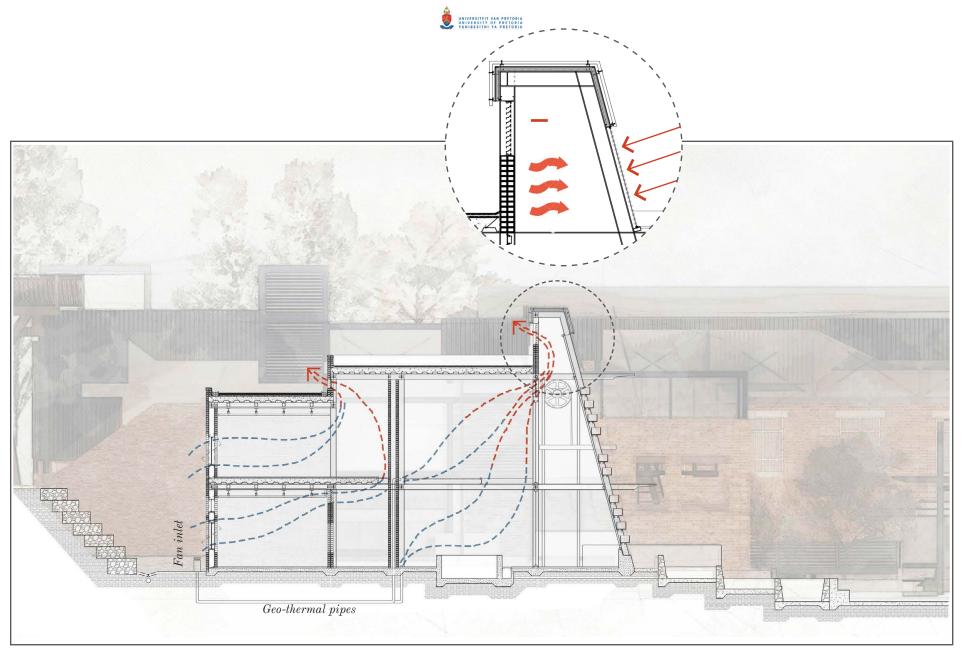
Section through proposed ventilation system in new structure (Author 2017)
